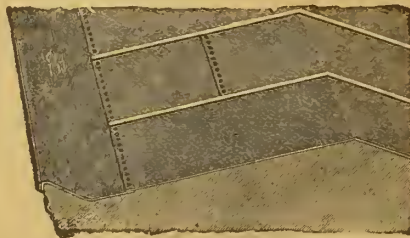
Covering Gutters with Ruberoid Roofing. Seams Covered by Mouldings.
